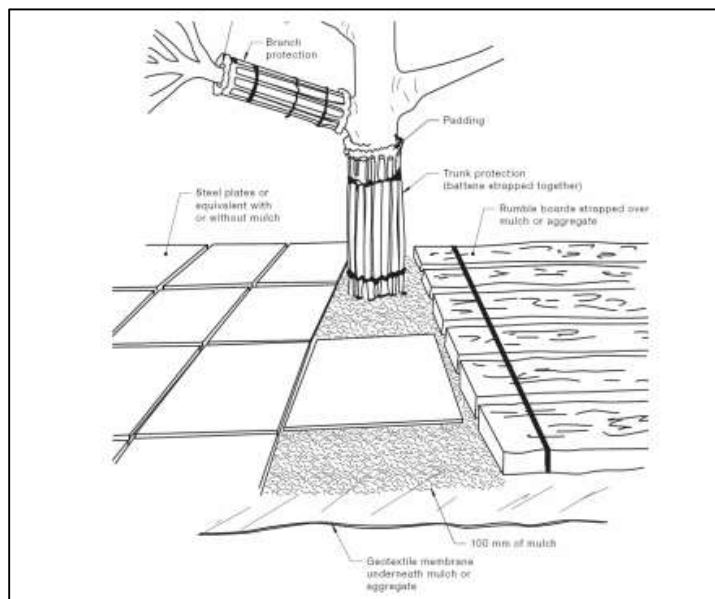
Branch and trunk Protection example (Standards Australia, 2025).
